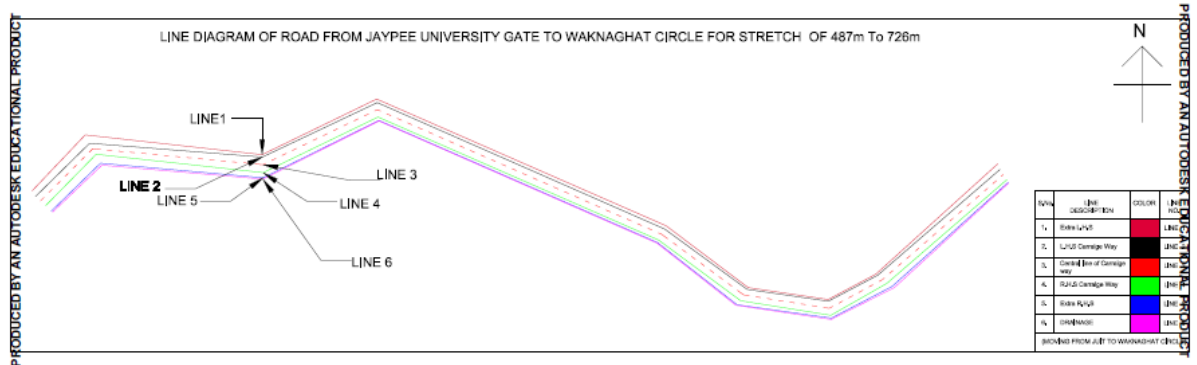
Auto cad drawing for road stretch from 487m to 726m
